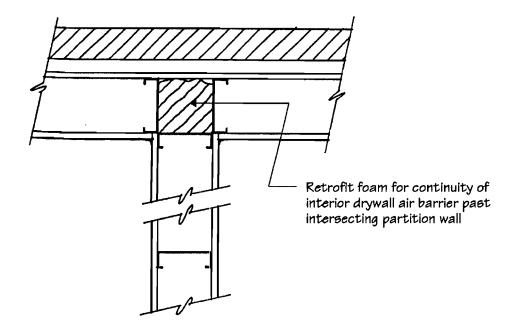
11 RETROFIT DETAIL FOR CONTINUITY OF INTERIOR DRYWALL
